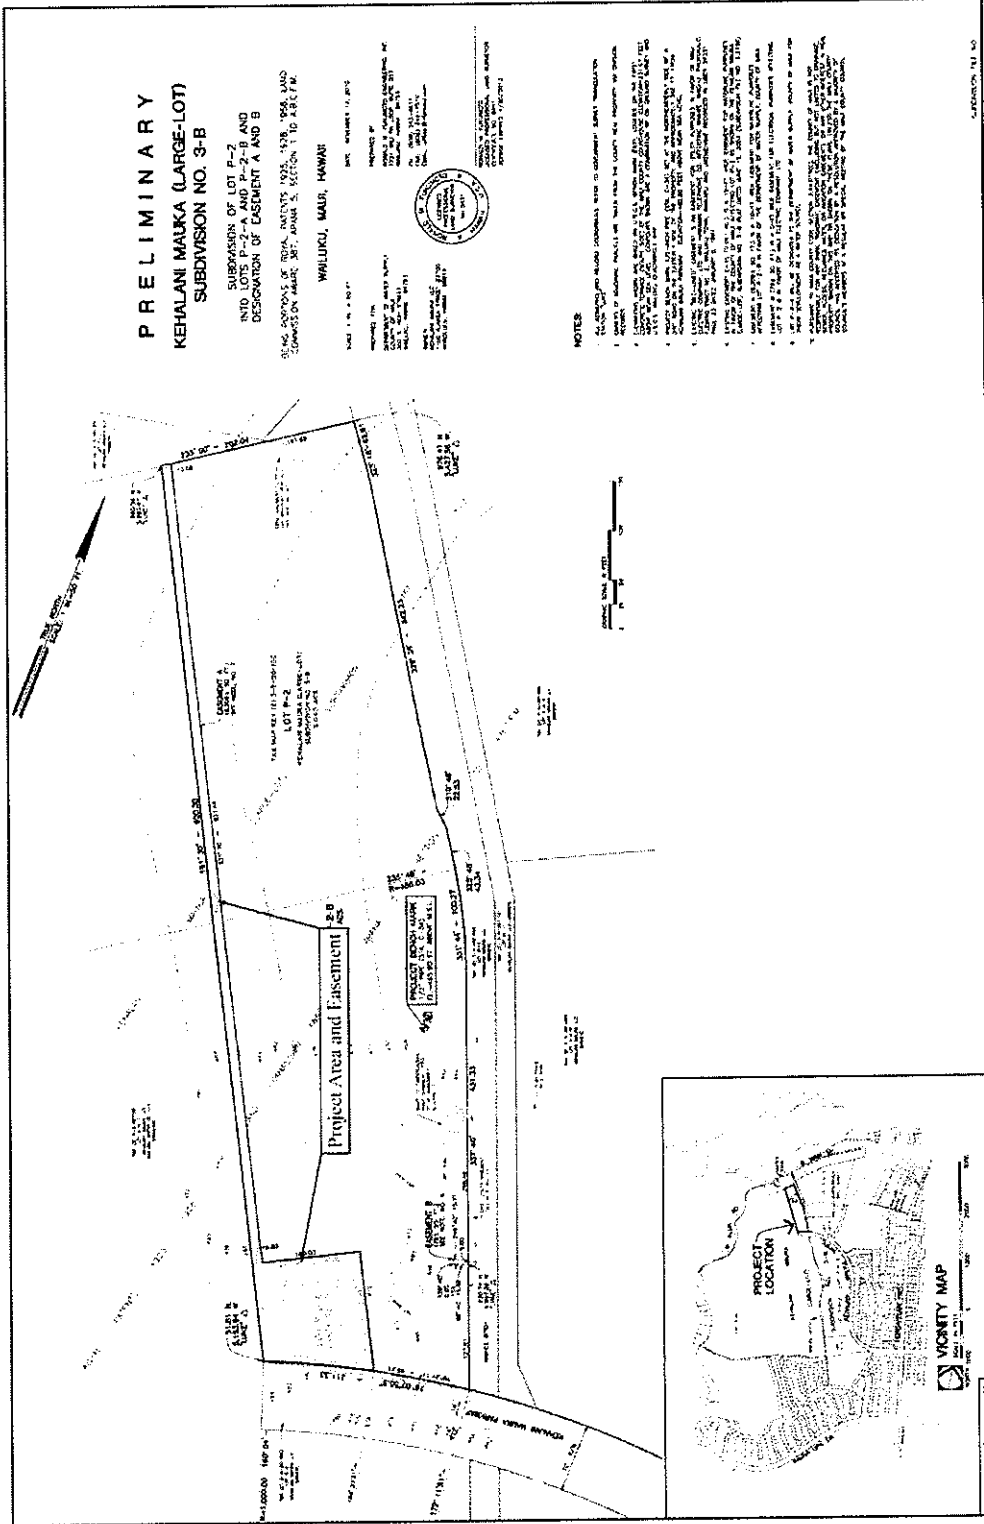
Plan View of Project Area Showing Proposed Well Site (plan courtesy of client).
